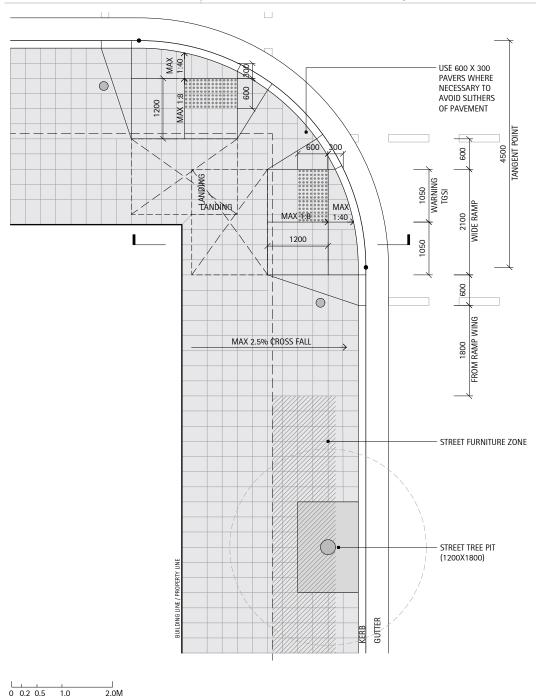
Streets Corner Plan: 4500 Radius 2100 Ramp
